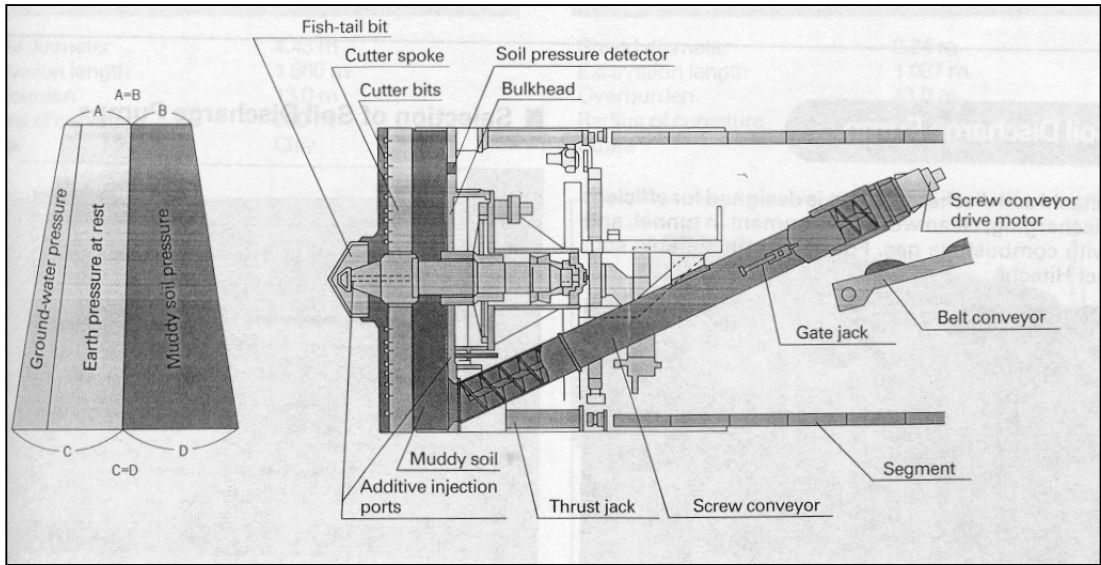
A schematic drawing of the typical EPB machine (after Howden, 1996)
